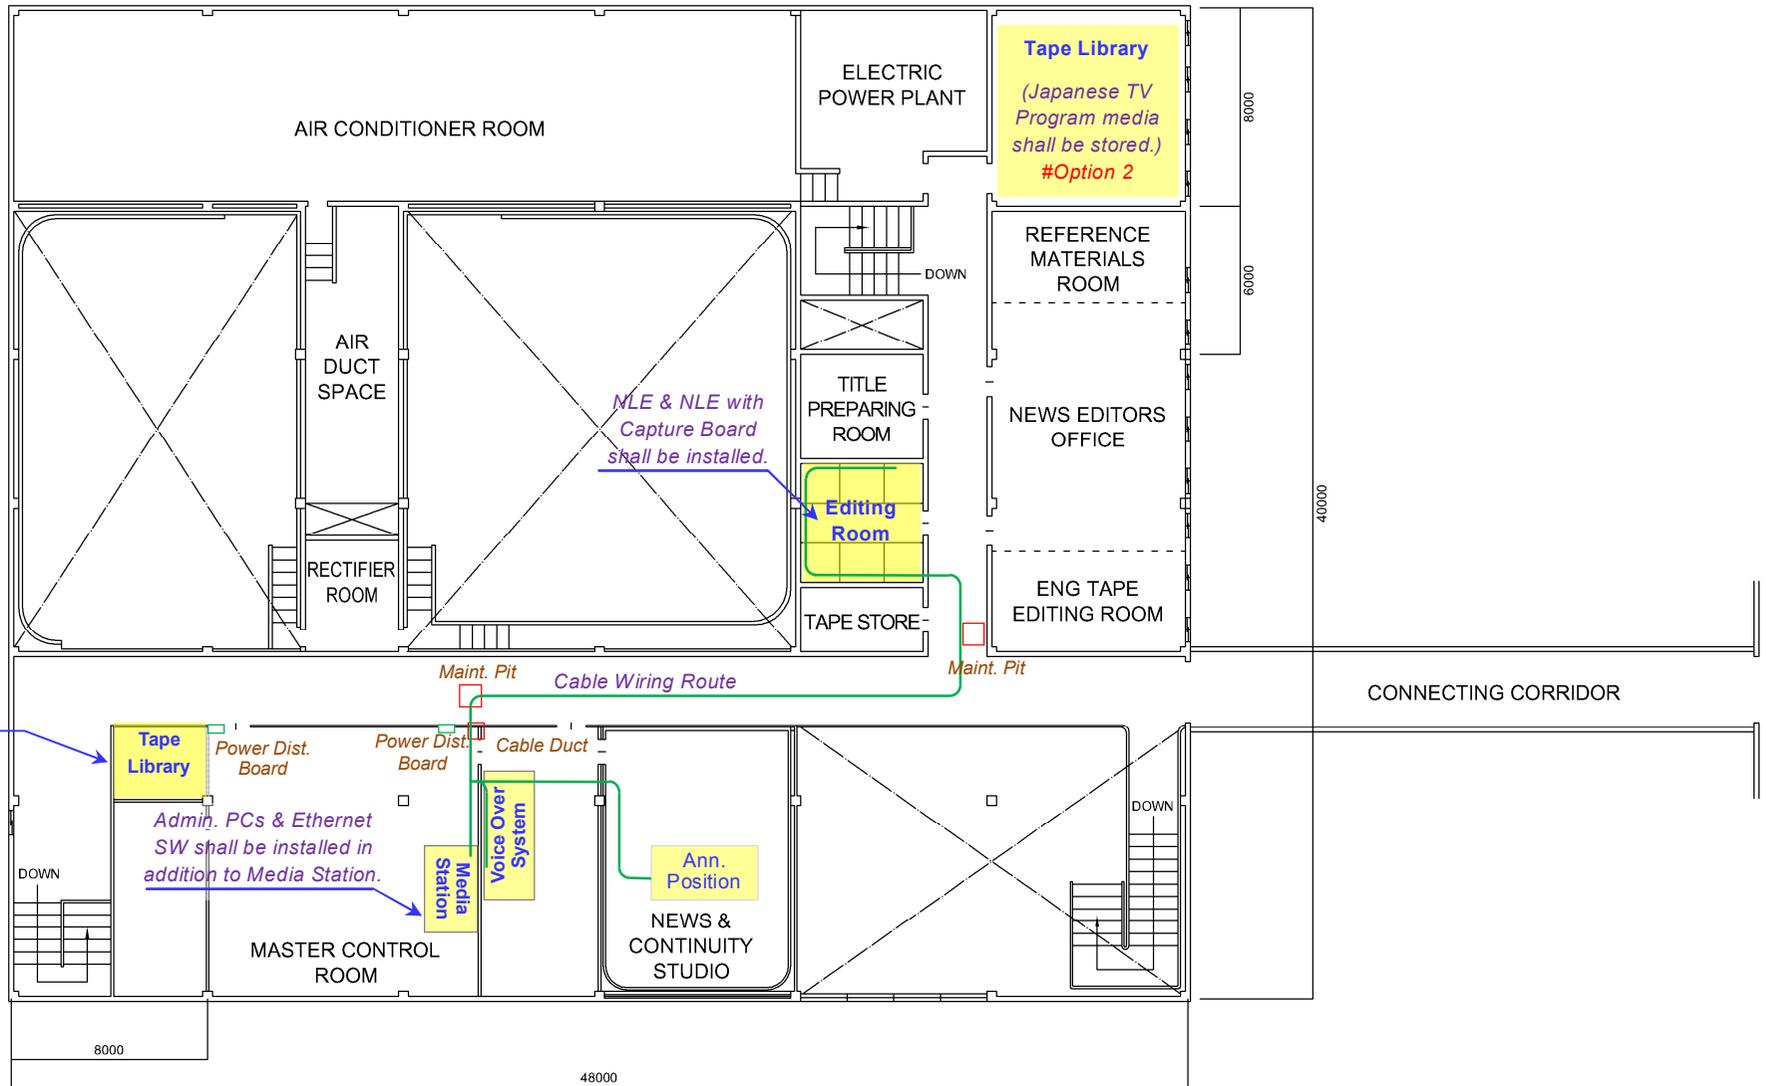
Installation Layout of Broadcast Editing Equipment and Japanese TV Programs
